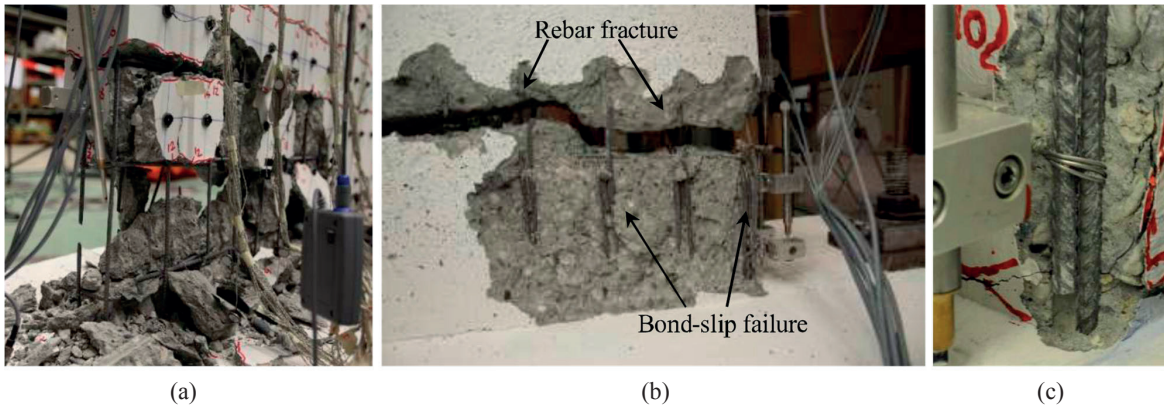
Base of the wall edge without flange in the last load stage: (a) TW2; (b) TW3; (c) Photographic evidence of bond slip failure in TW3 at LS16 (1% drift), after spalling of the corners.
